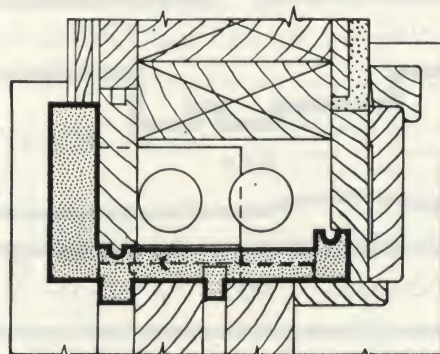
Full 2x4" studding or extra thick sheathing. Inside ground casing rabbeted to depth required.
